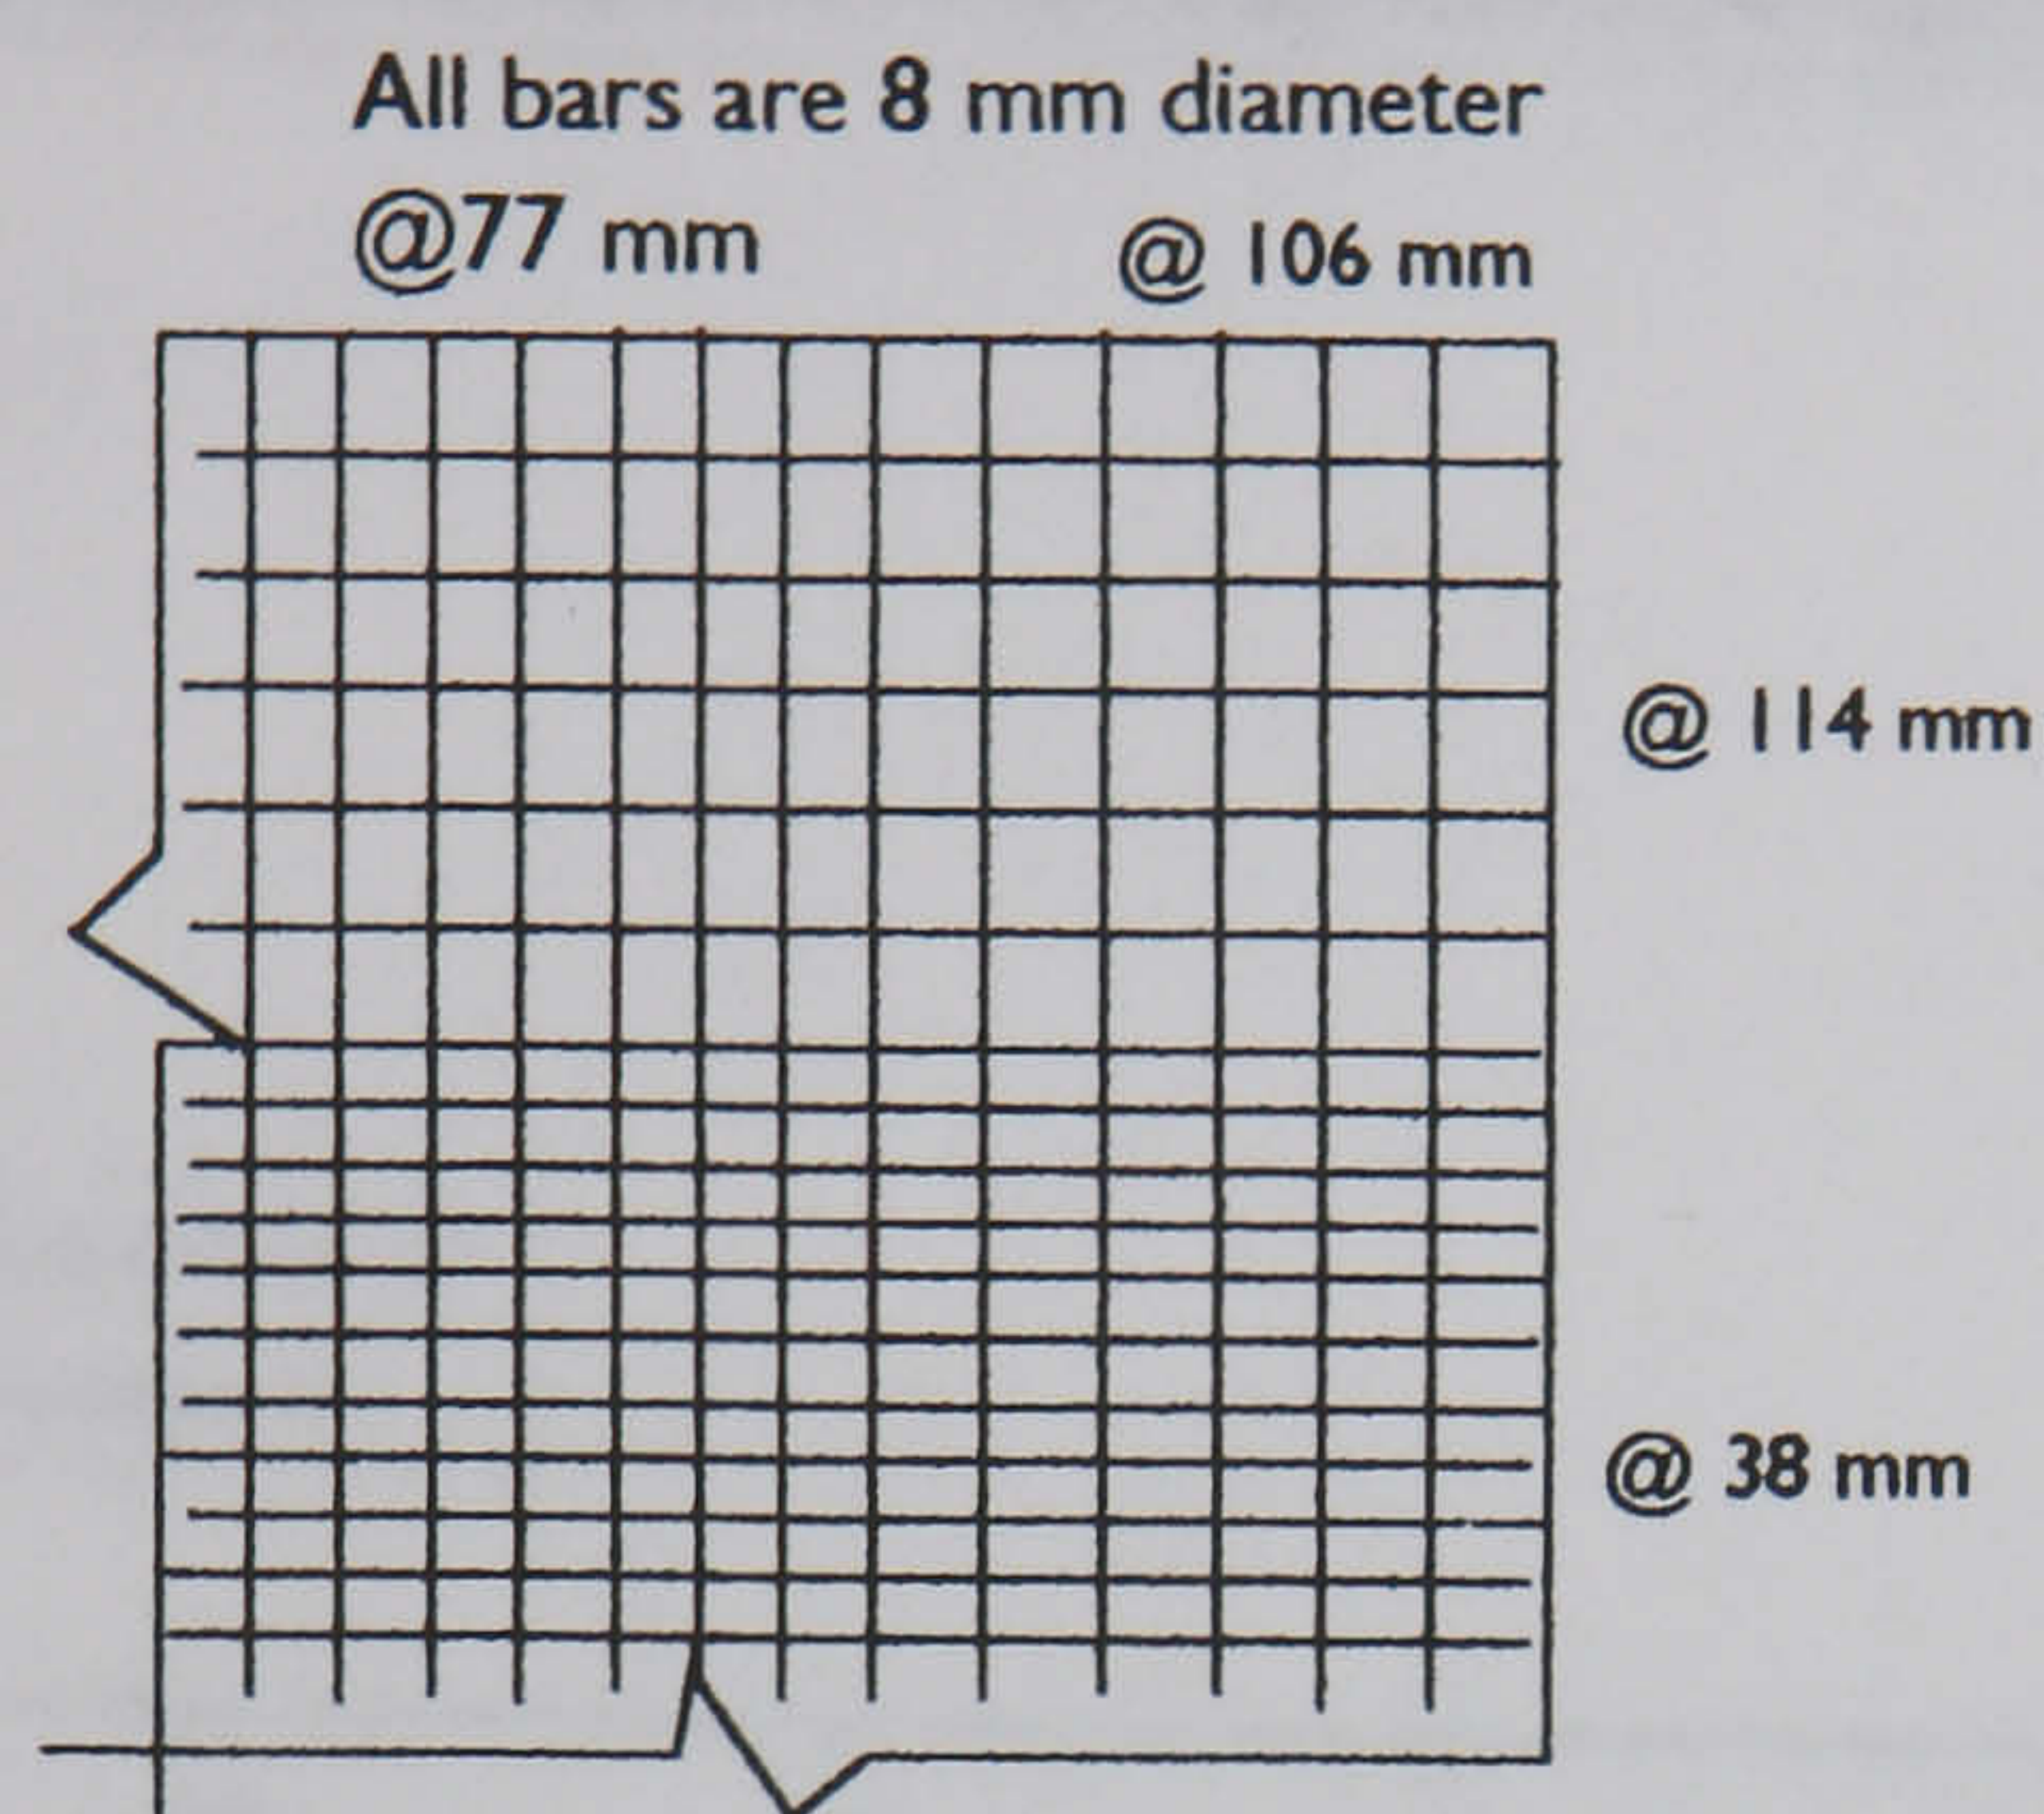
Steel layout for Taylor's [8] slab No. 8.
